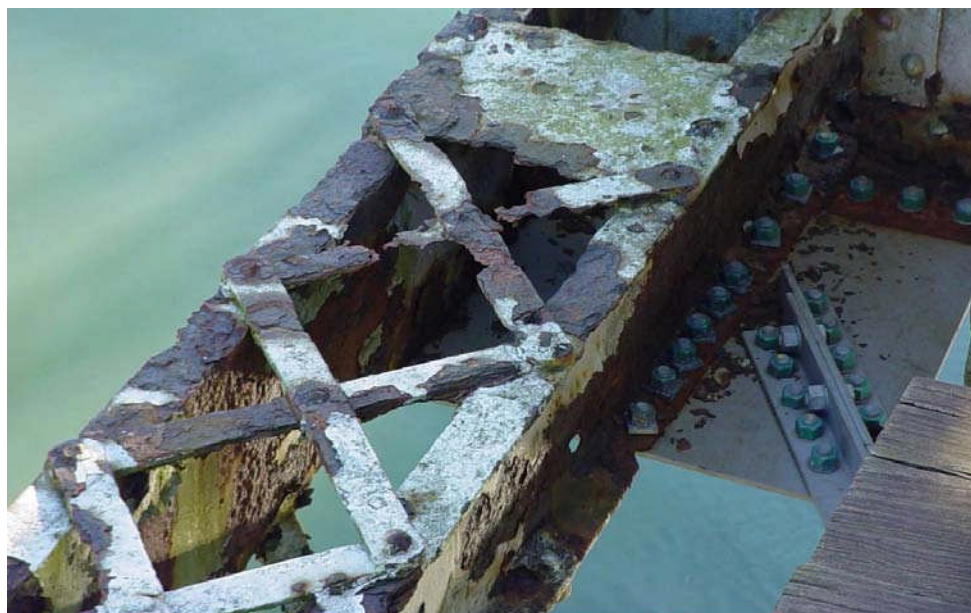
Corrosion and Section Loss on Truss Bottom Chord
